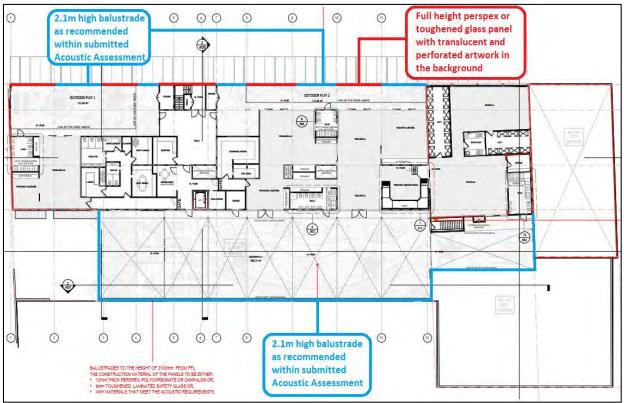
Extract of applicant's submitted first floor plan, detailing the location of the solid 2.1m high acoustic wall to surround the outdoor play spaces, and full height Perspex or glass panels to Outdoor Play Space 1 and
